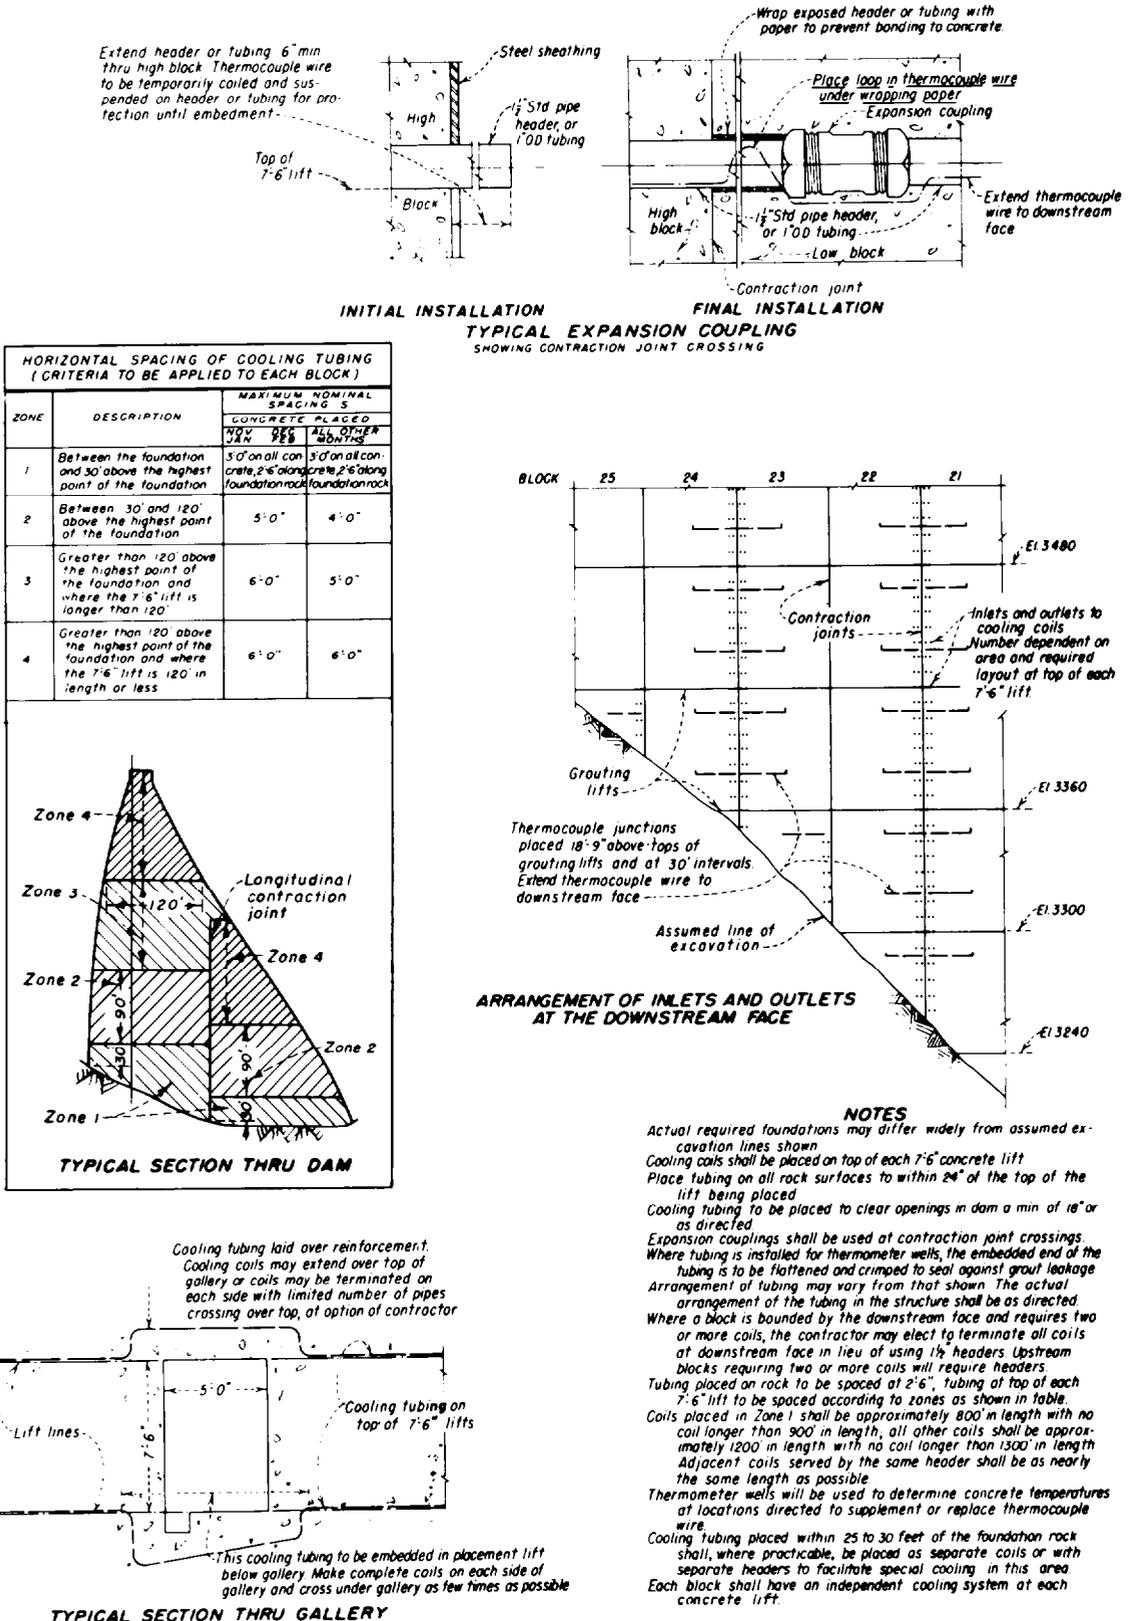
Glen Canyon Dam—concrete cooling details.—288-D-3022
